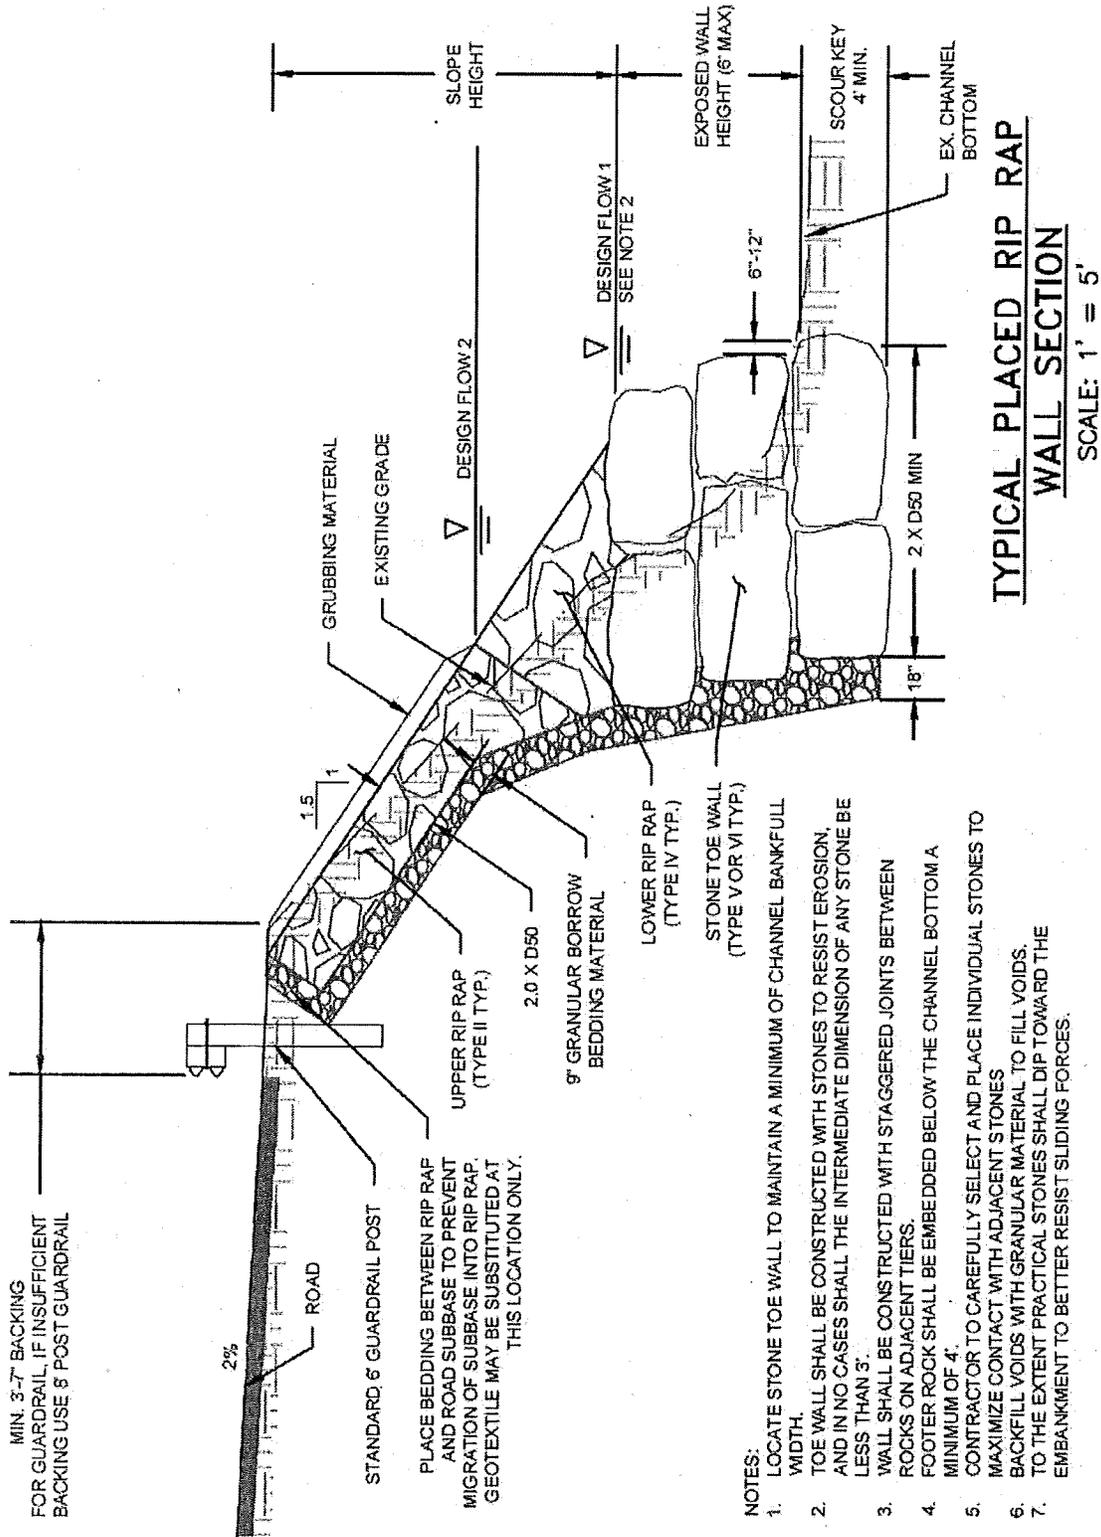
Placed riprap wall typical detail. (Source: Dubois & King and Milone & MacBroom, Inc., 5/1/2014)
